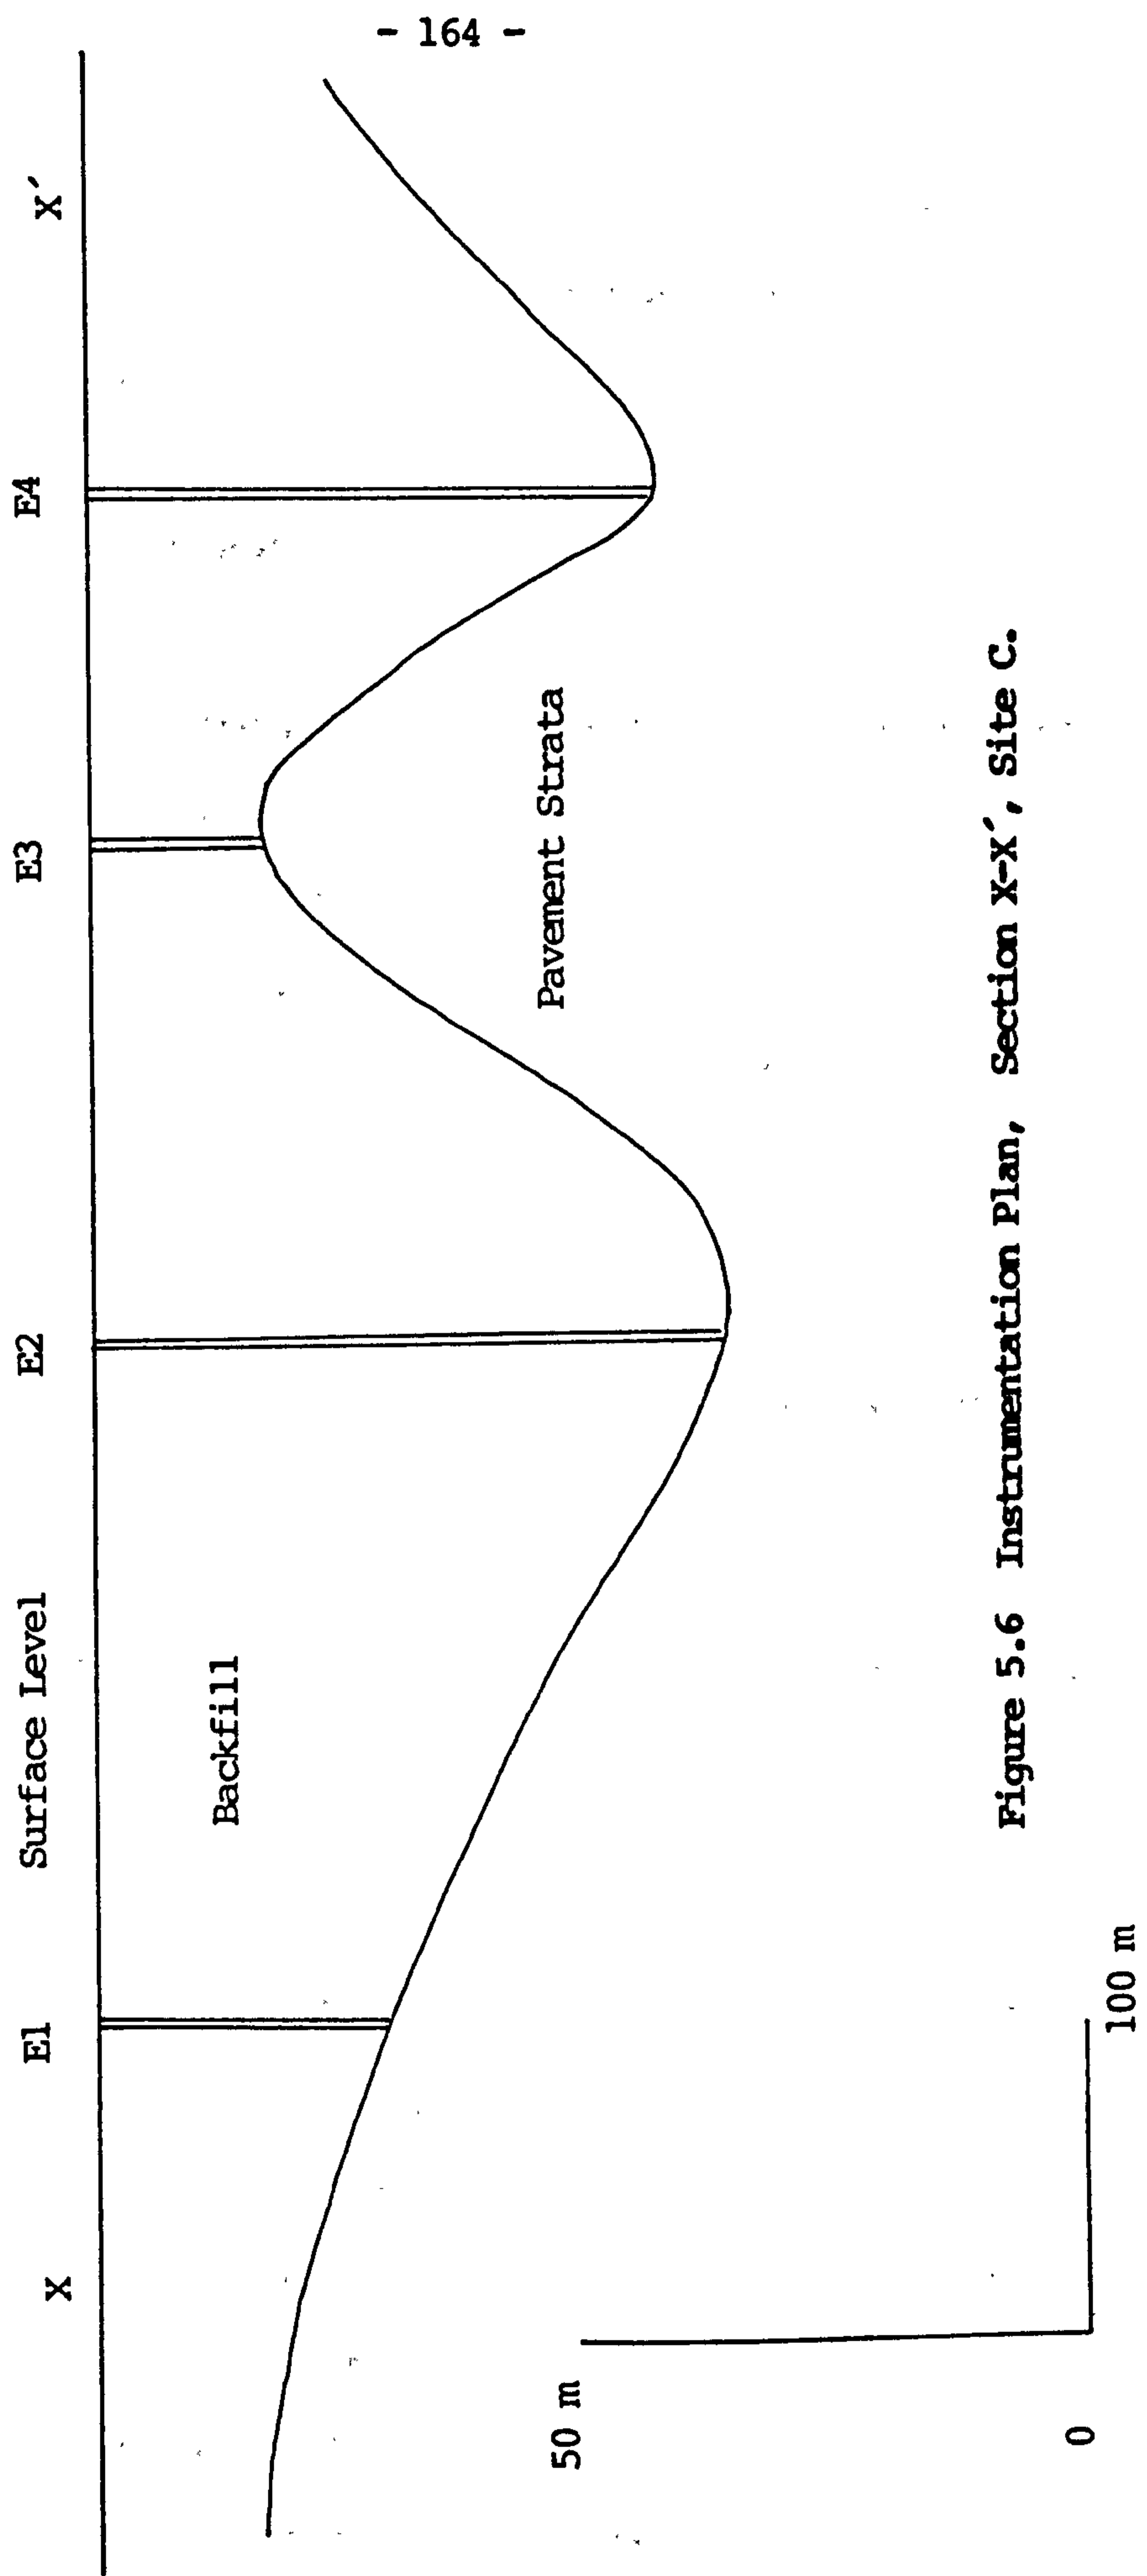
Instrumentation Plan, Section X-X', Site C.
